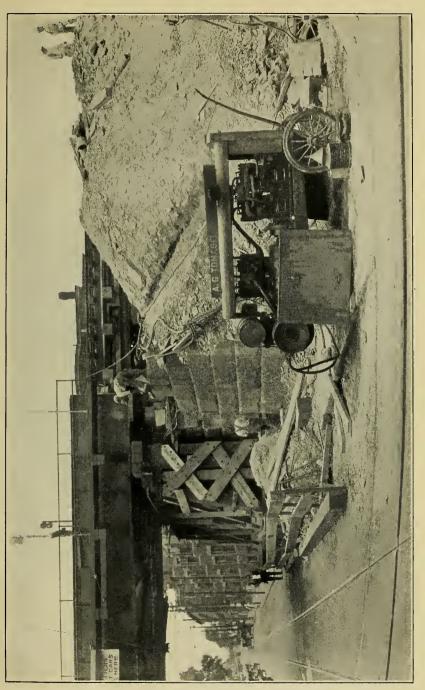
PLATE I.—TIMBER SHORING SUPPORTING GENEVA AVENUE BRIDGE DURING REMOVAL OF GRANITE ABUTMENT.
